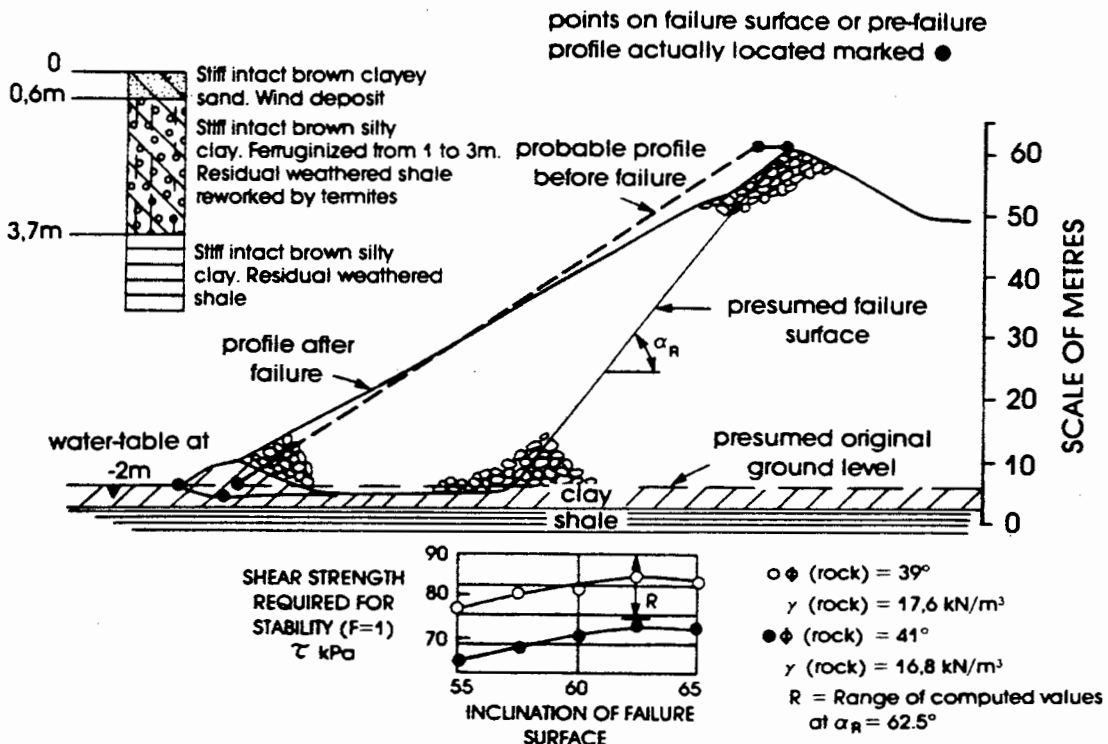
Section through a typical first-time slide in a rock dump on a clay foundation.
